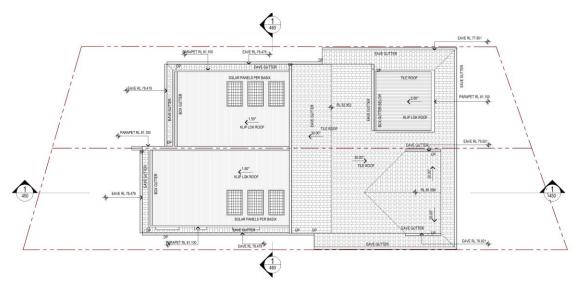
Proposed Roof Plan - 34 Frenchmans Road
